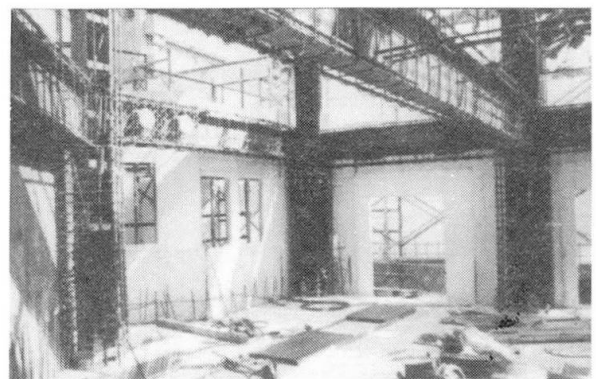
External wall formwork of Ichikawa Heights bldg. (Chiba pref.)
